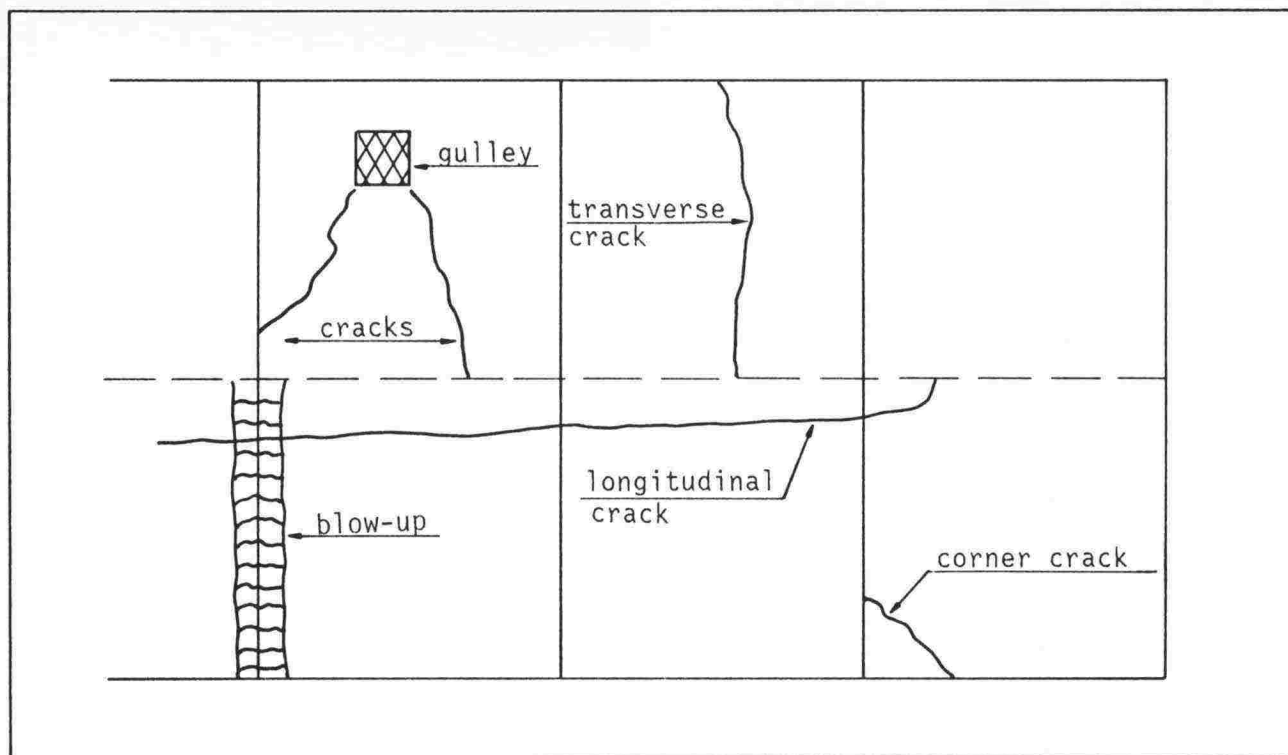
b. Most common structural defects of concrete pavements
